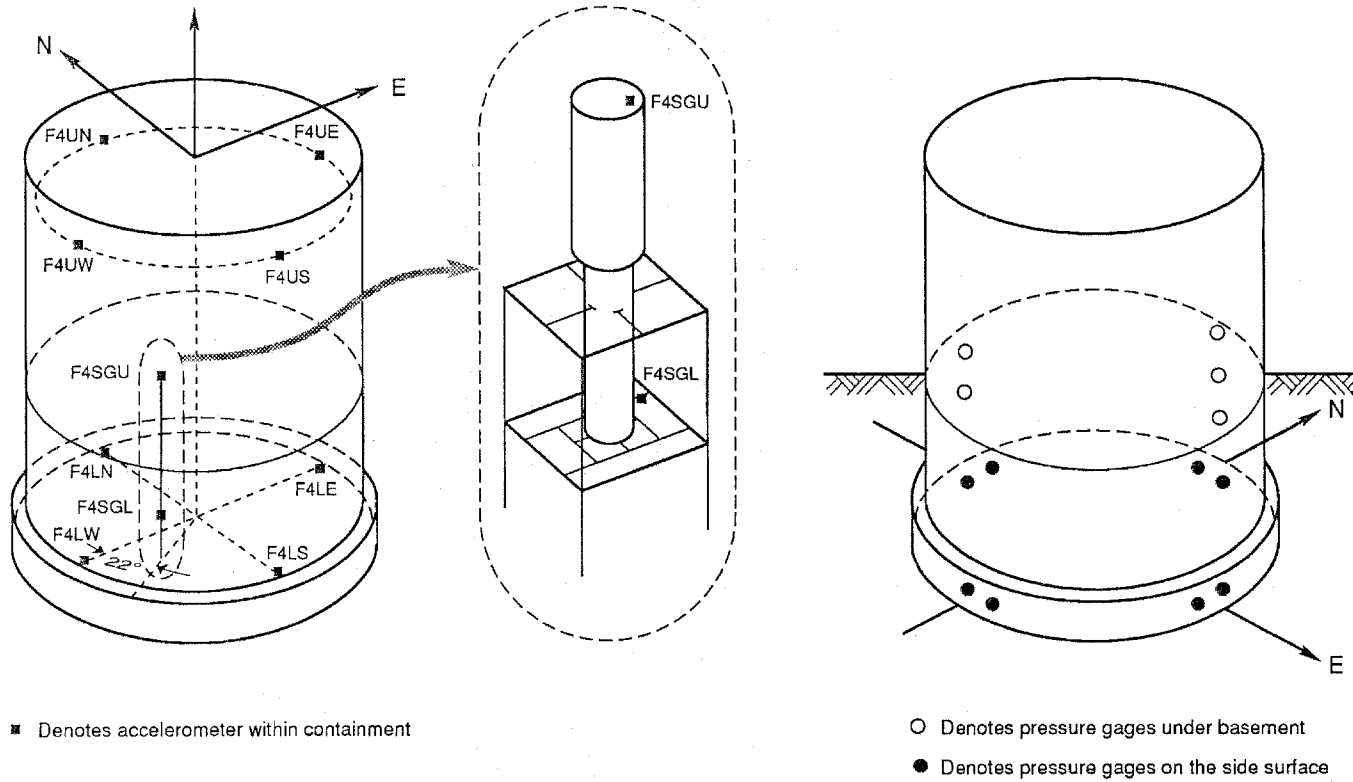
1/4-Scale Model Accelerometer and Pressure Guage Layouts
